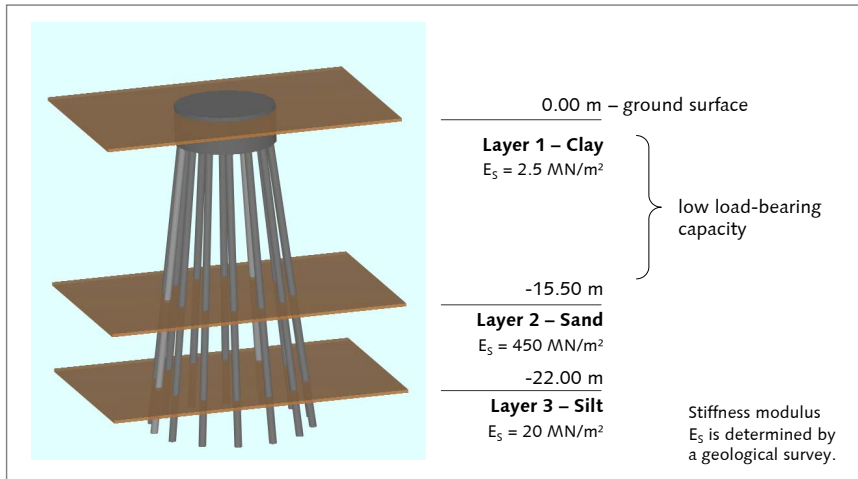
Foundation body and soil layers at the onshore site in Bremerhaven
